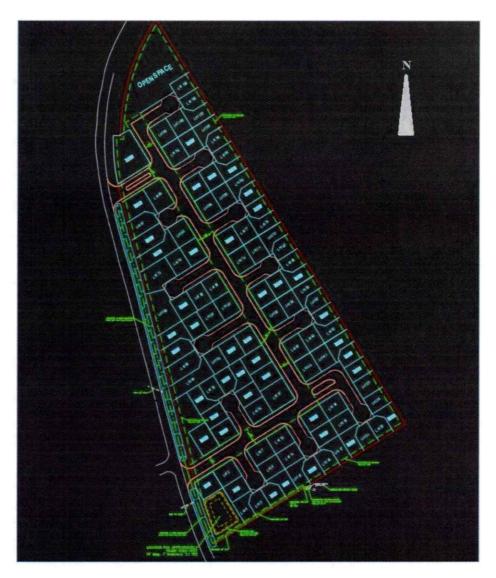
Proposed Layout plan of Rock Ridge Courtyard
